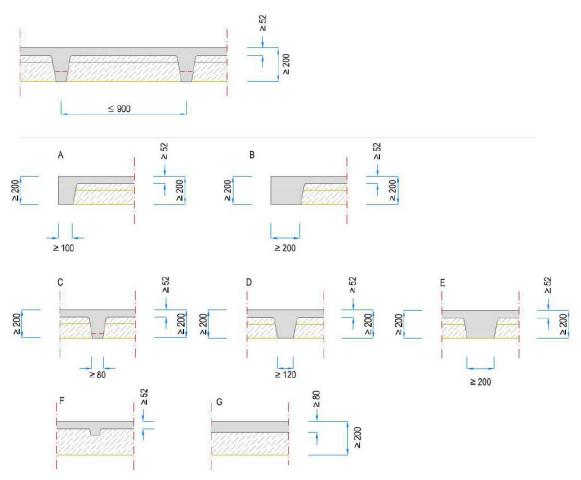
Structural section with insulation between trapezoidal ribs.
